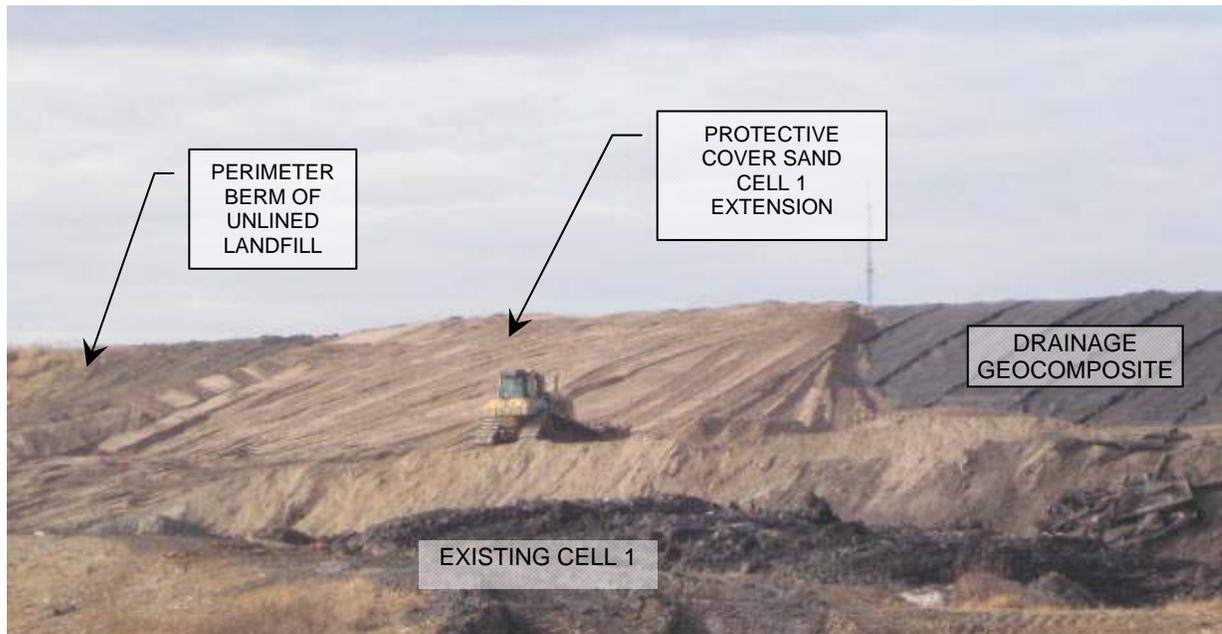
Initial placement of the protective cover sand over the drainage geocomposite (12/9/2008).
